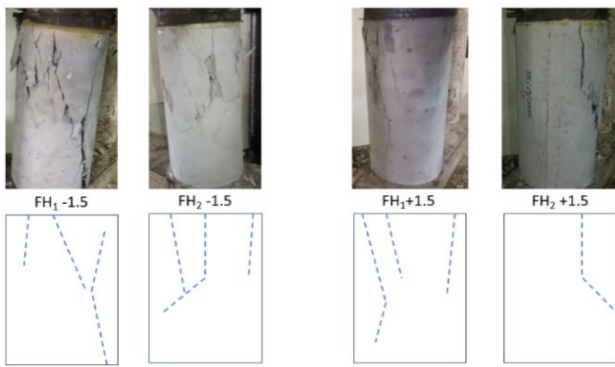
Crack pattern in 14-day-old concrete tested with flange with hole (FH) suppressor
